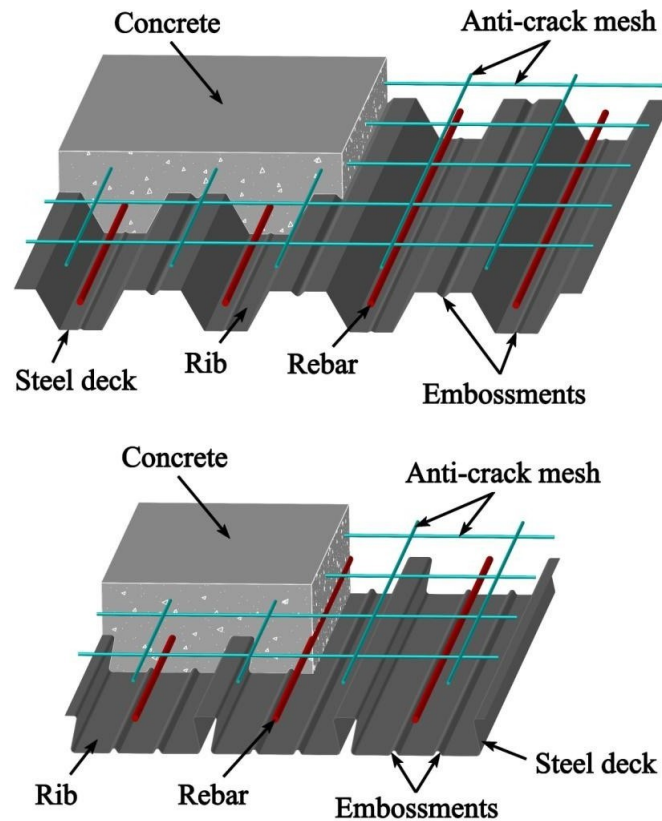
Typical layout of composite slabs trapezoidal and reentrant profiles [2]
